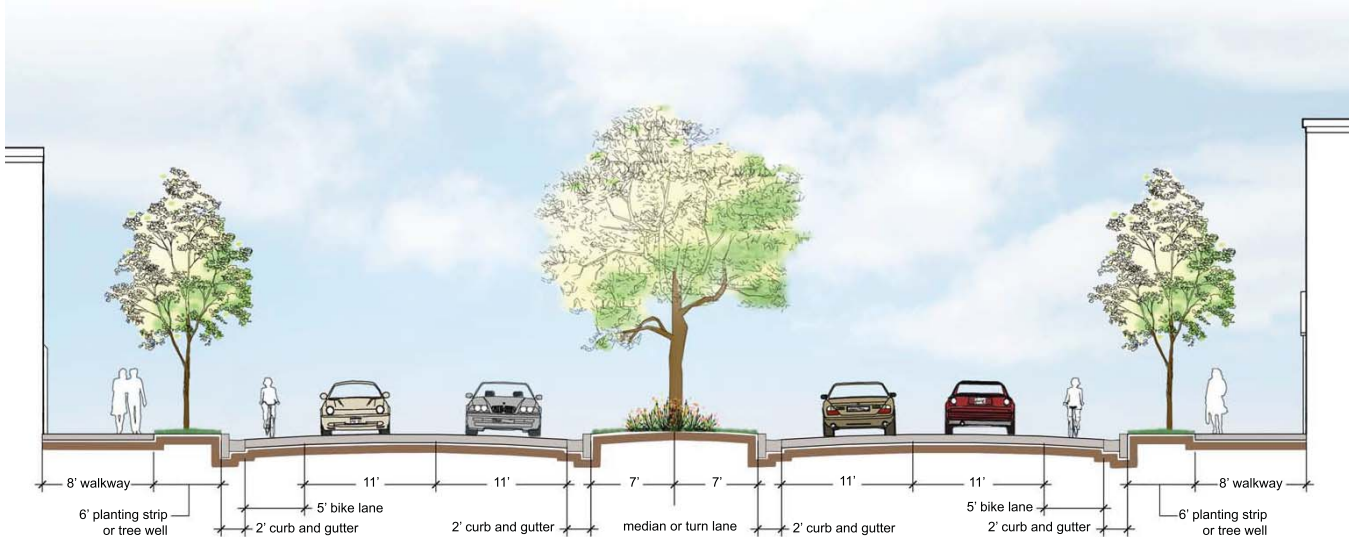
CORRIDOR ROAD CROSS SECTION A1/A2 - 4 LANE - 104' Right-Of-Way
